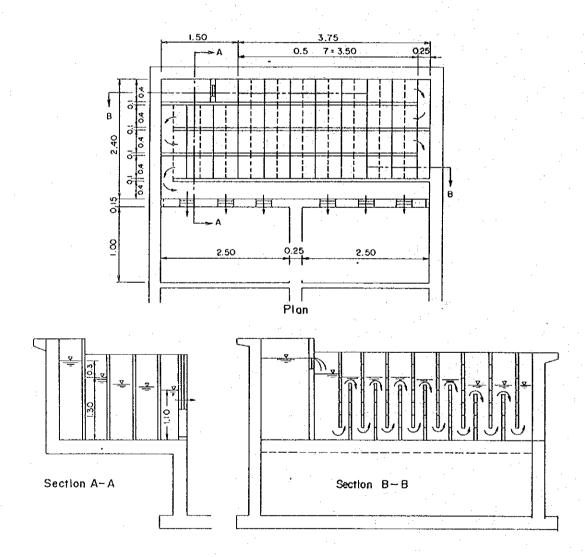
Rapid Mixer and Flocculator Arrangement
